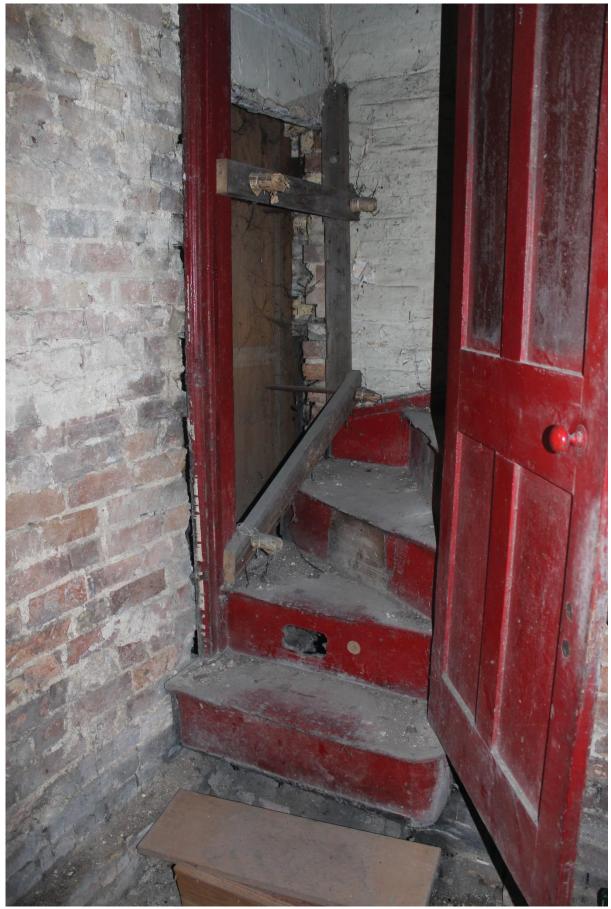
Doorway and stairs to first floor on west side. Note poorly blocked doorway.
